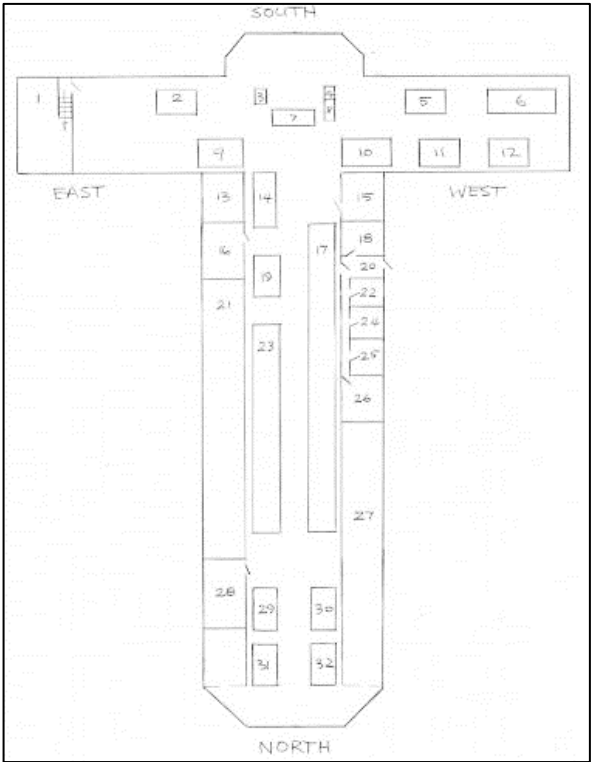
Floorplan of transmitter hall (RAF Greatworth 2019)
